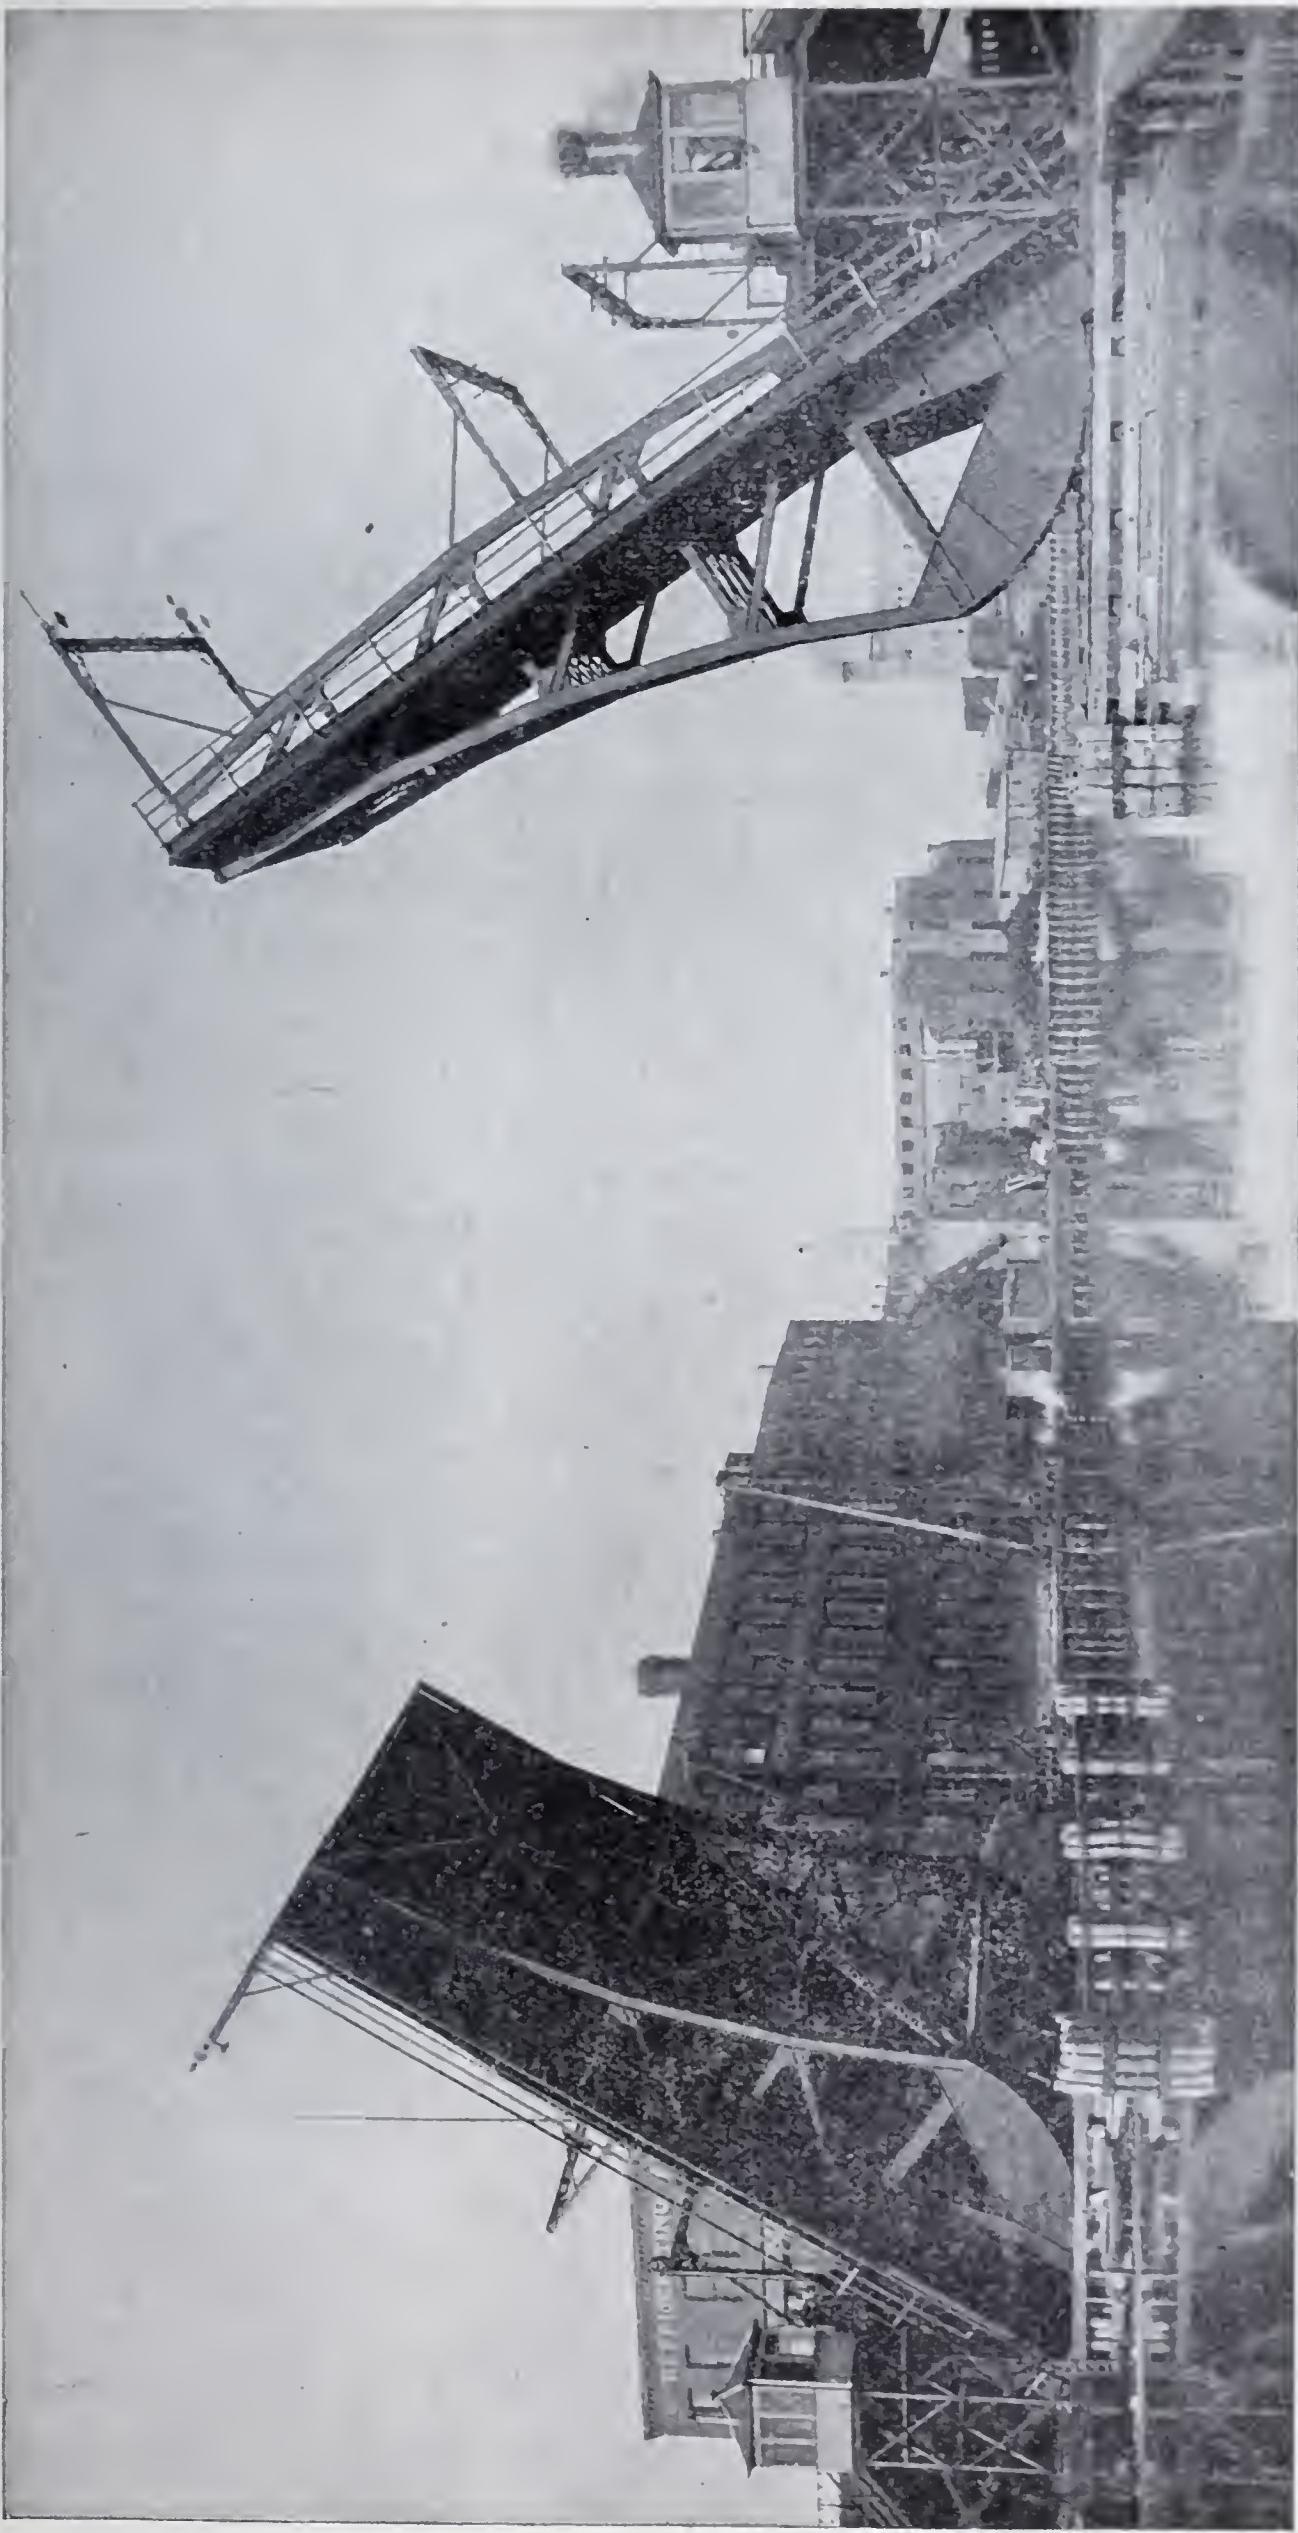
Scherzer Rolling Lift Bridge, North Halsted Street, Chicago.
